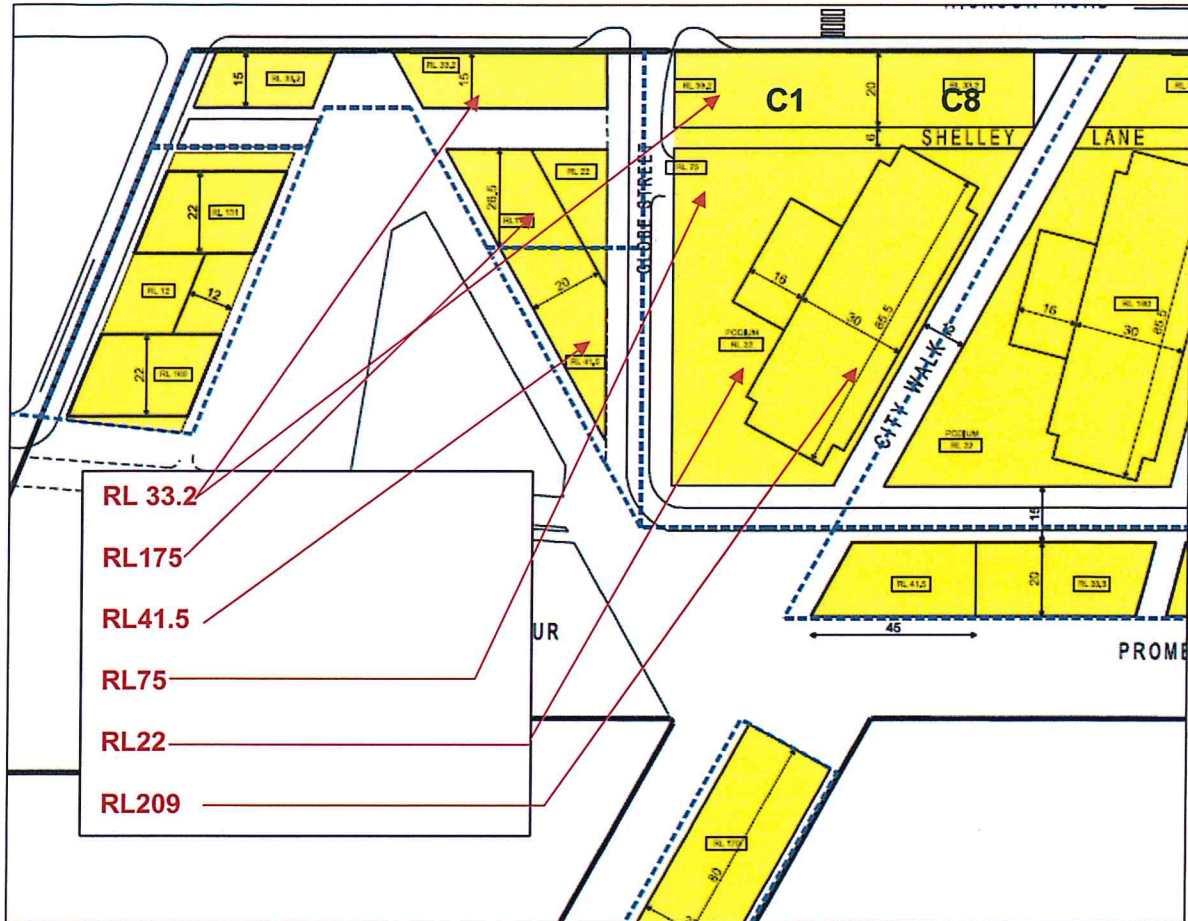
Proposed Indicative Maximum Building Height, Location and Dimensions Map (MOD 6)
